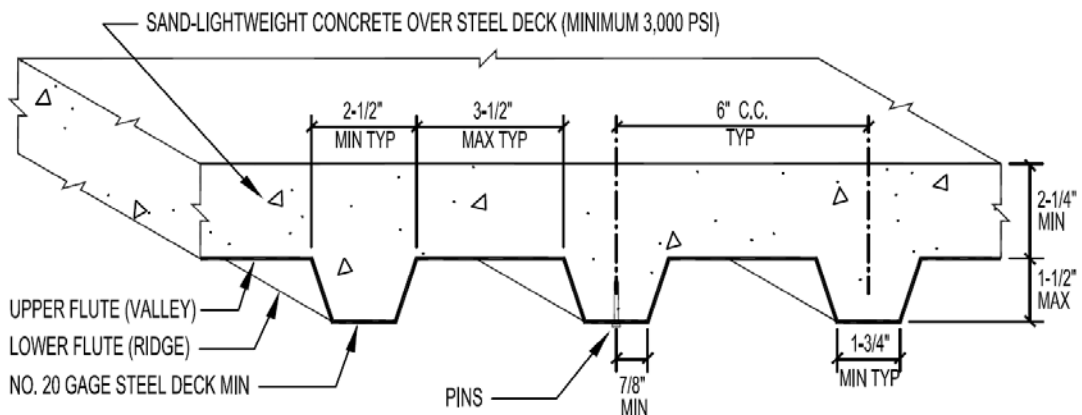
CONFIGURATION OF CONCRETE FILLED 1 1/2-INCH DEEP STEEL DECK (LOWER FLUTE INSTALLATIONS)
